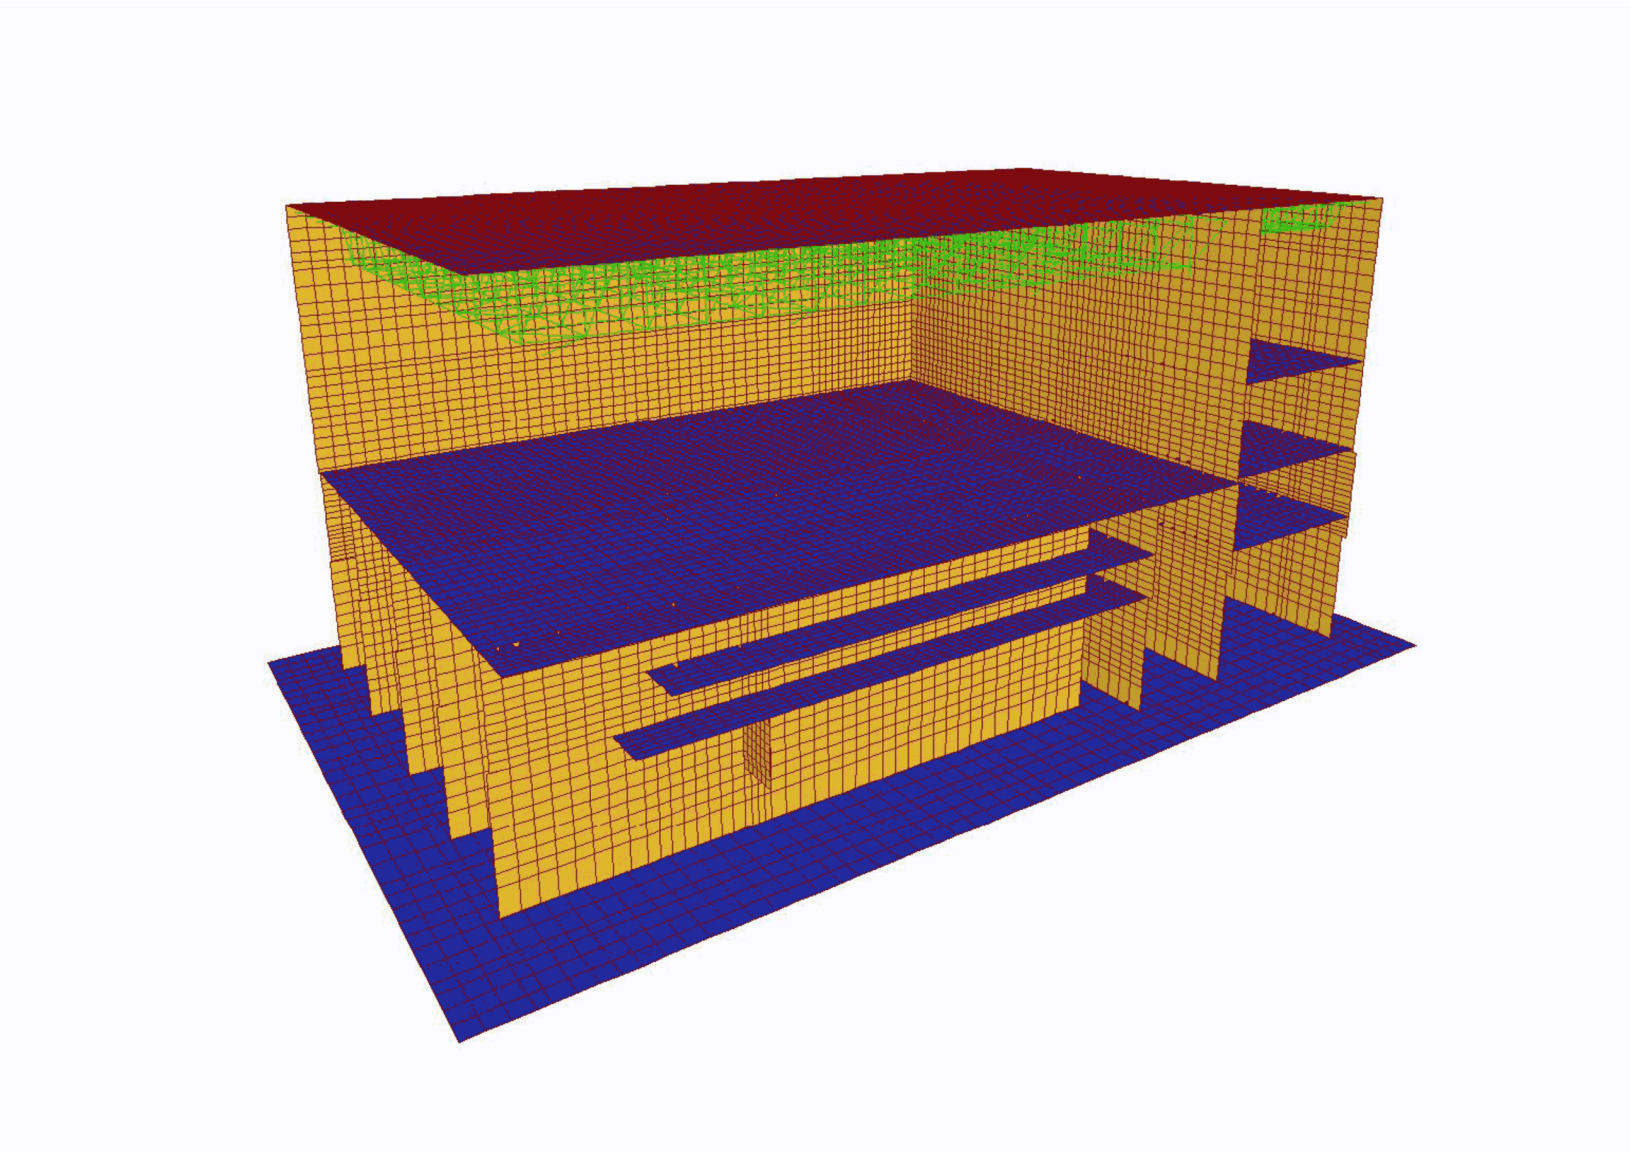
H.3-6 Radwaste Building SAP2000 Model (South and West Walls Removed)
